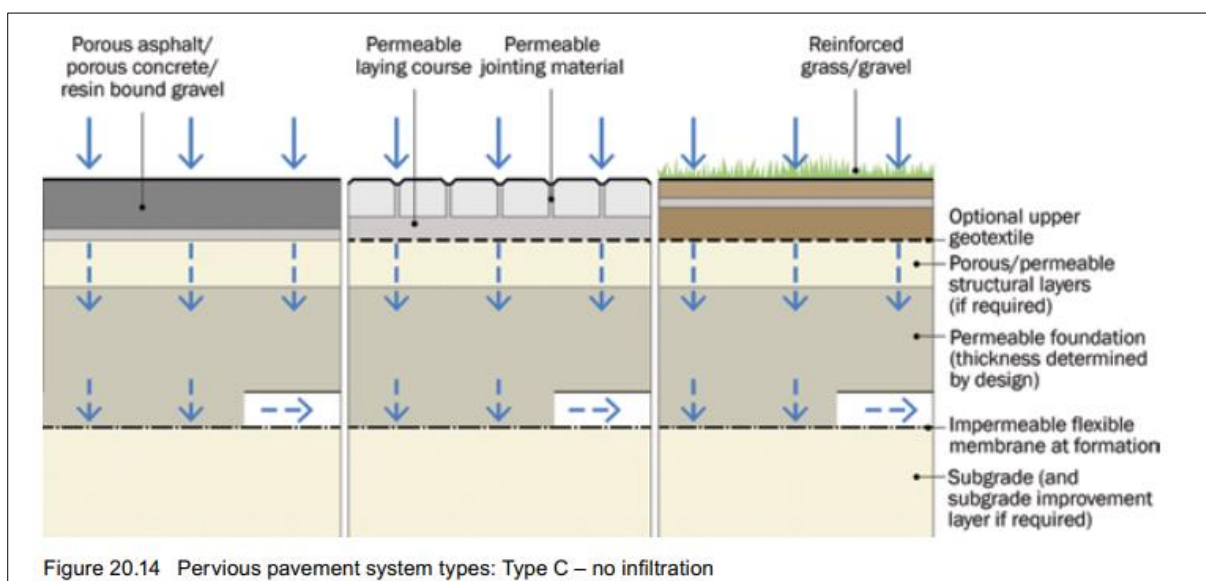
Typical Cross Section of a no infiltration permeable paving (Extract from CIRA SuDs Manual)
